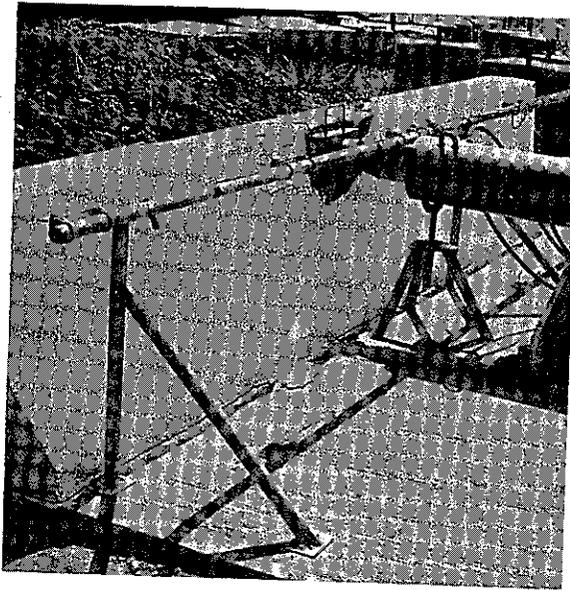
Front face of barrier during Series II test showing crack along bottom edge of barrier face and cracks around loading plate.
